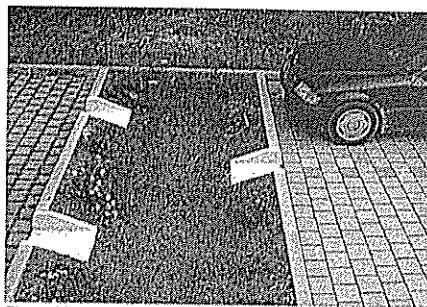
Curbing and drainage swale handle flows that exceed the design rainstorm.
